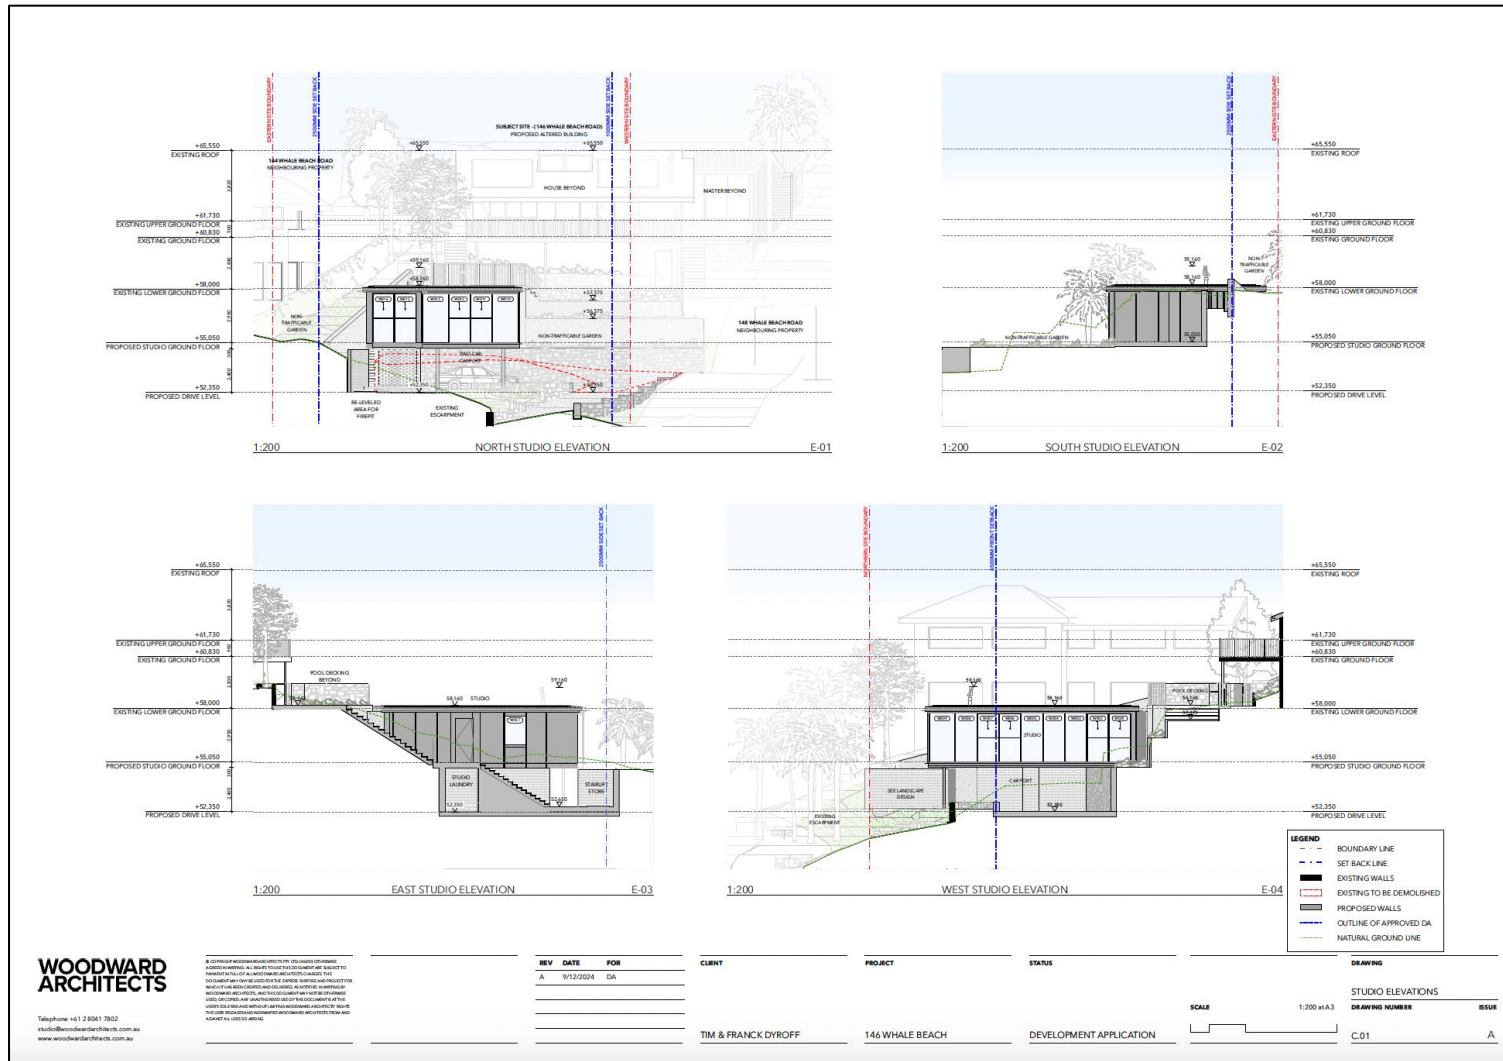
ILLUSTRATES PROPOSED STUDIO ELEVATIONS
